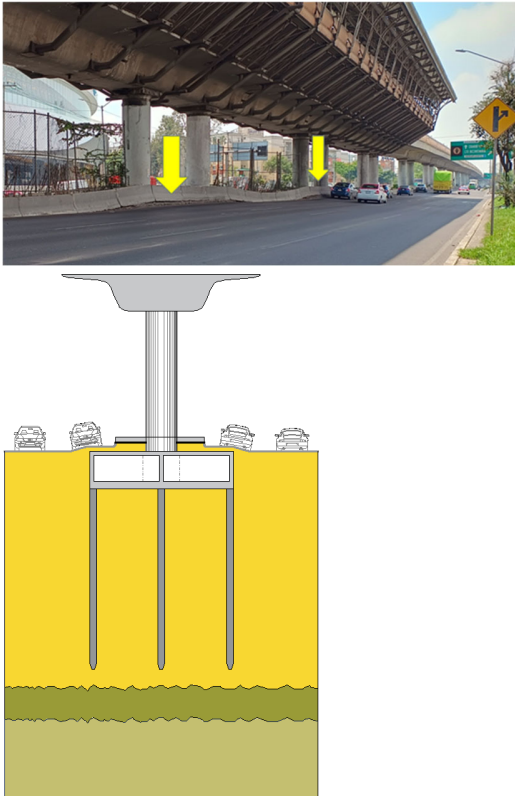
Emersion of a piled box foundation for the Metro viaduct, affecting the lower road.
